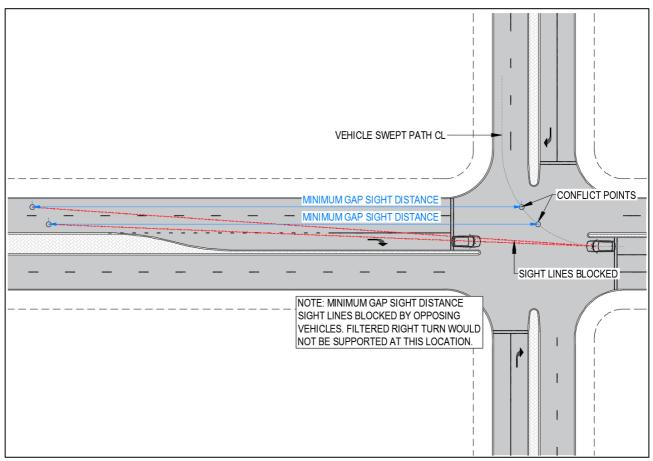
Minimum Gap Sight Distance (MGSD) - Failing
